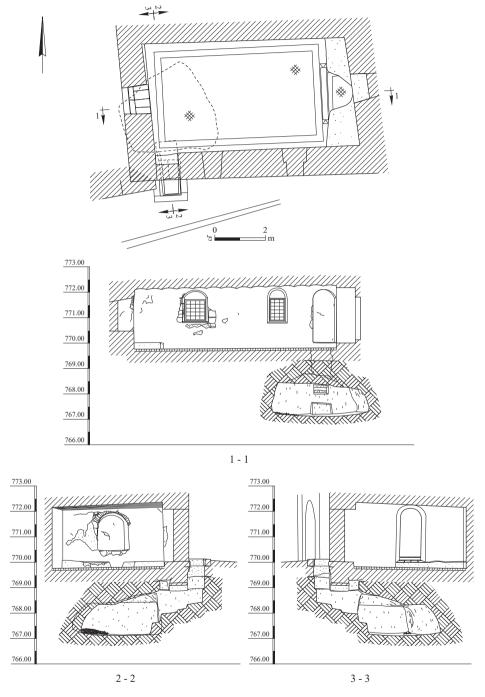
Plan and sections of the chapel and crypt (drafting: O. Rose).
